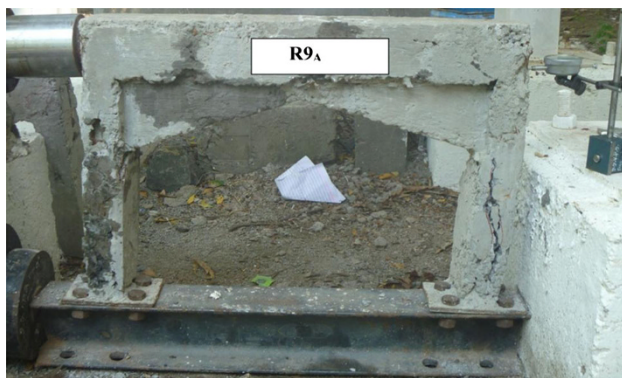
Epoxy repaired, with partial concrete infill central braced frame
